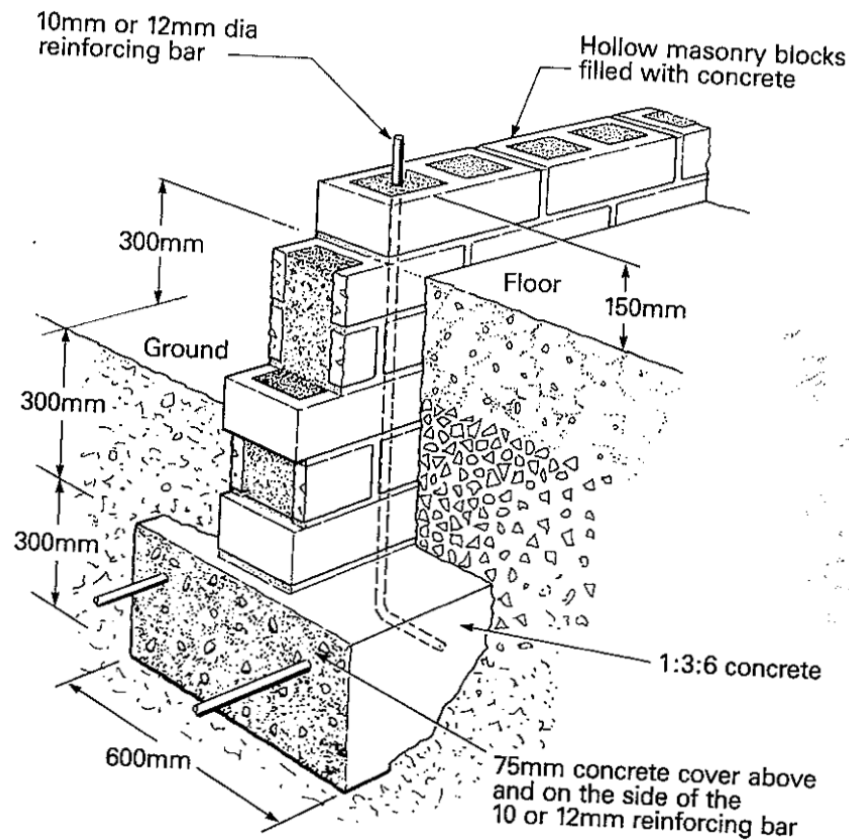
Masonry block with concrete footing foundations (Mayo, 1988).
